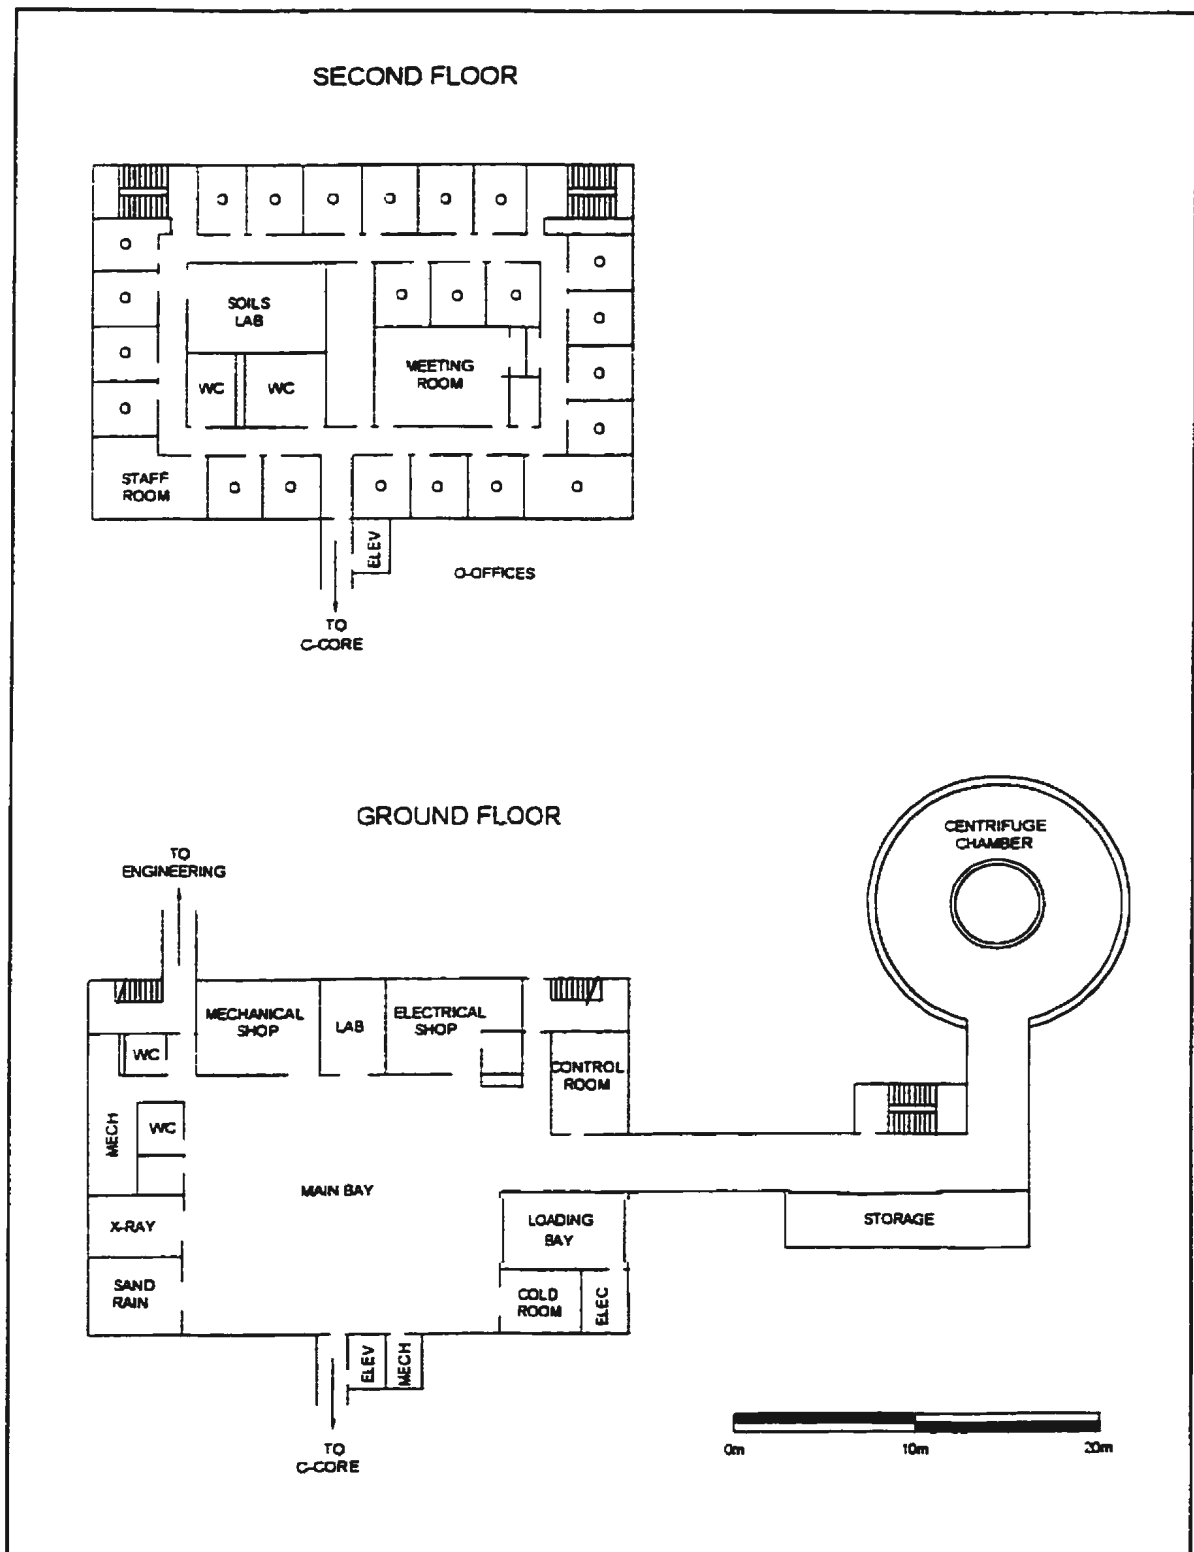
Plan of the C-CORE Centrifuge Centre.
